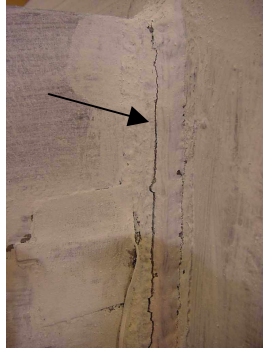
Fracture in HAZ in Beam-Column Connection, Test No. 3
